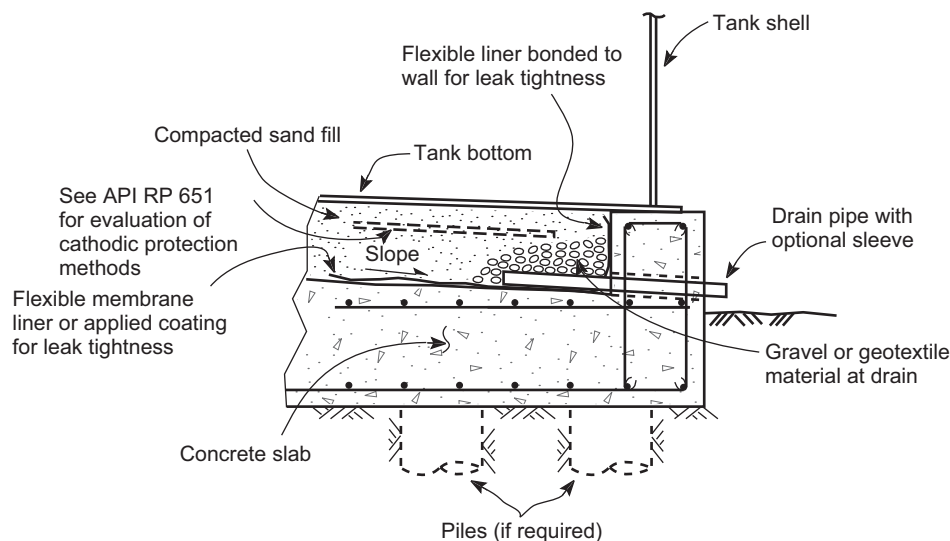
Reinforced Concrete Slab with Leak Detection at the Perimeter (Typical Arrangement)
